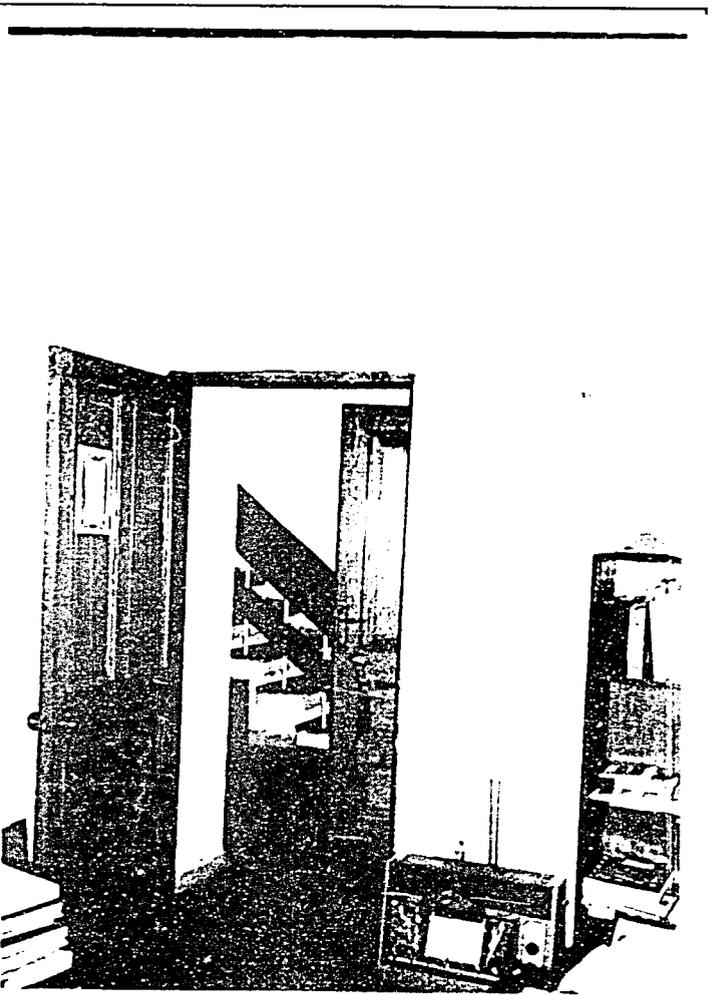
Peshawar CCSC Headquarters Building. Hallway (Fig. 20) viewed from inside Construction Supervisor's office. Route cable to right side of office.
